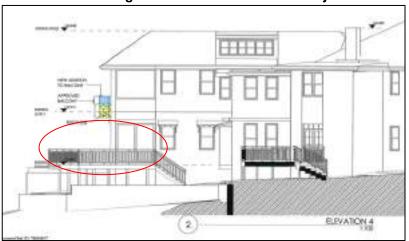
Elevation of No. 17 Waiwera Street Red outline indicating from where the views are obtained
